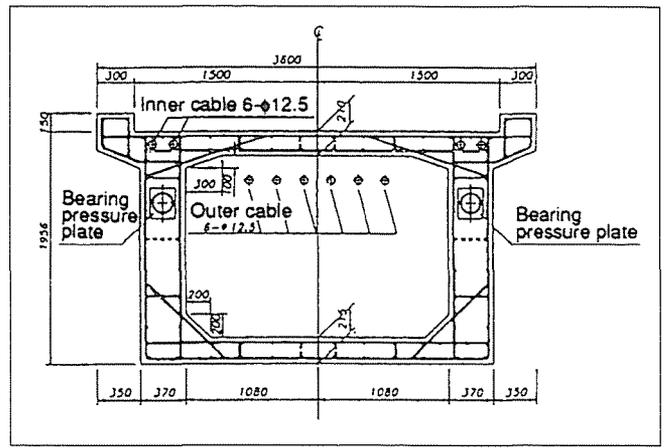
Cross section of Tsukude Bridge (Tokyo Rope, 1993)
